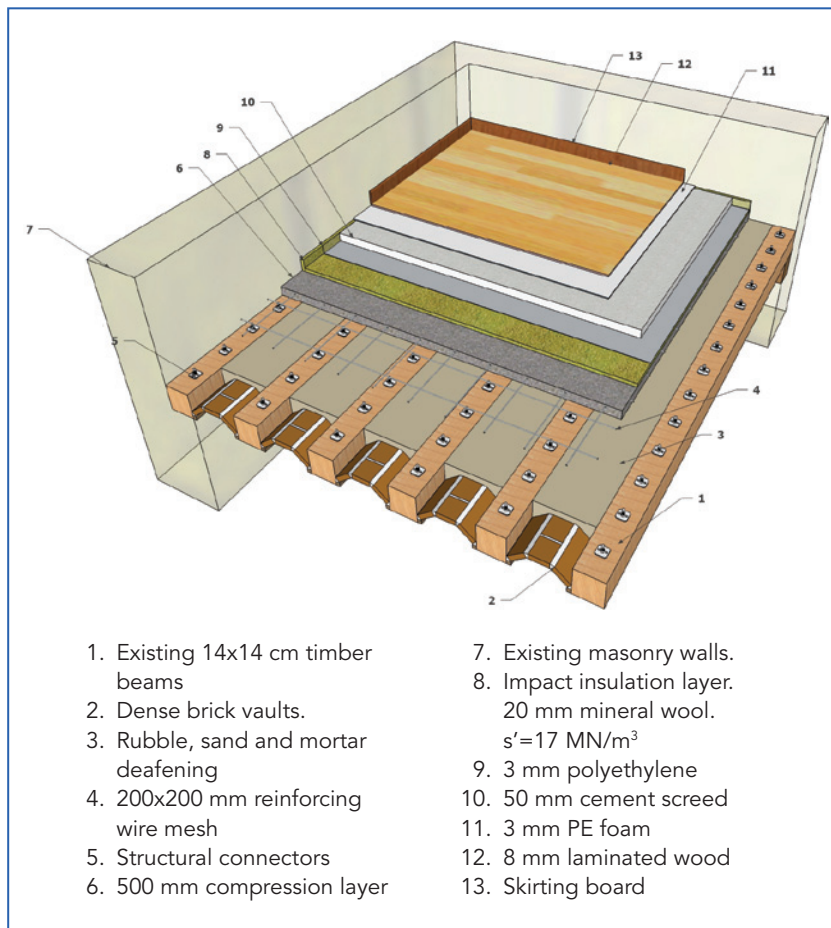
Example of a retrofitted timber floor. Timber beams and the brick vaults were maintained. Part of the infilling was removed. Structural connectors and a 50 mm compression layer were installed before the floating floor.
